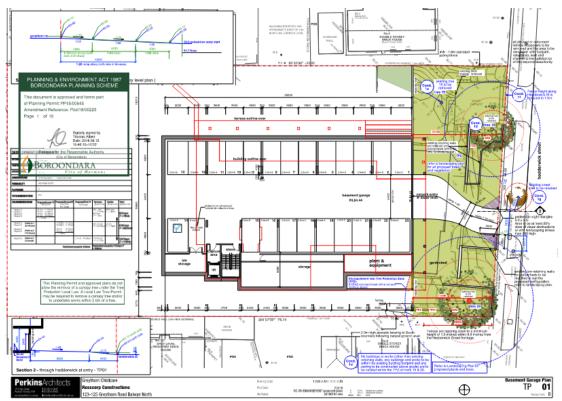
Endorsed Basement Plan (Post18/00223 - 15/8/2015)
